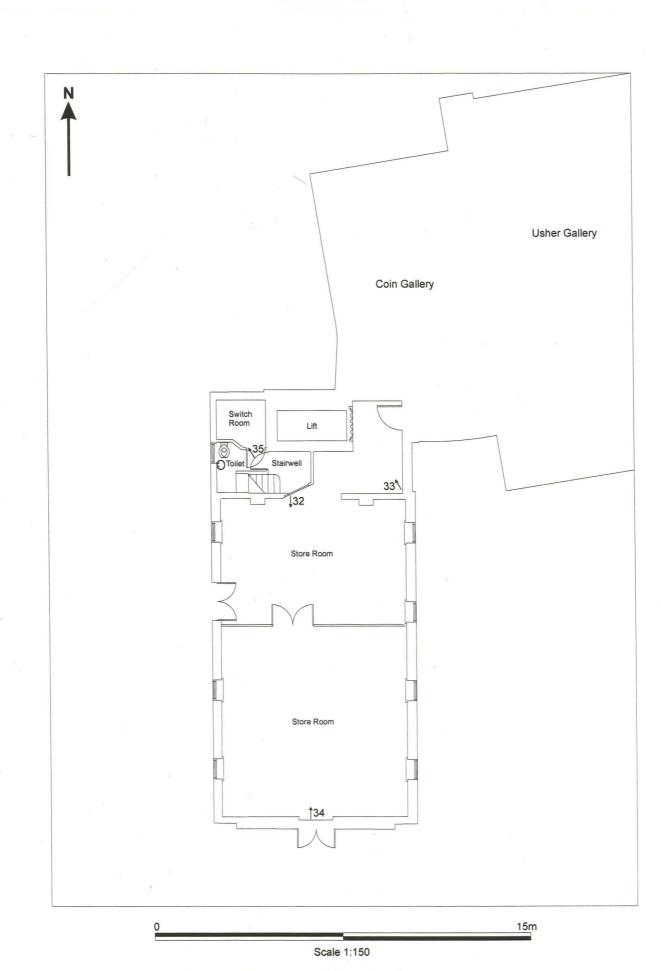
Basement plan of Curtois Gallery at scale 1:150. Numbered arrows indicate location and orientation of all basement shots (listed in Appendix 2). Exterior shots shown on Figure 2, ground floor shots shown on Figure 3.
